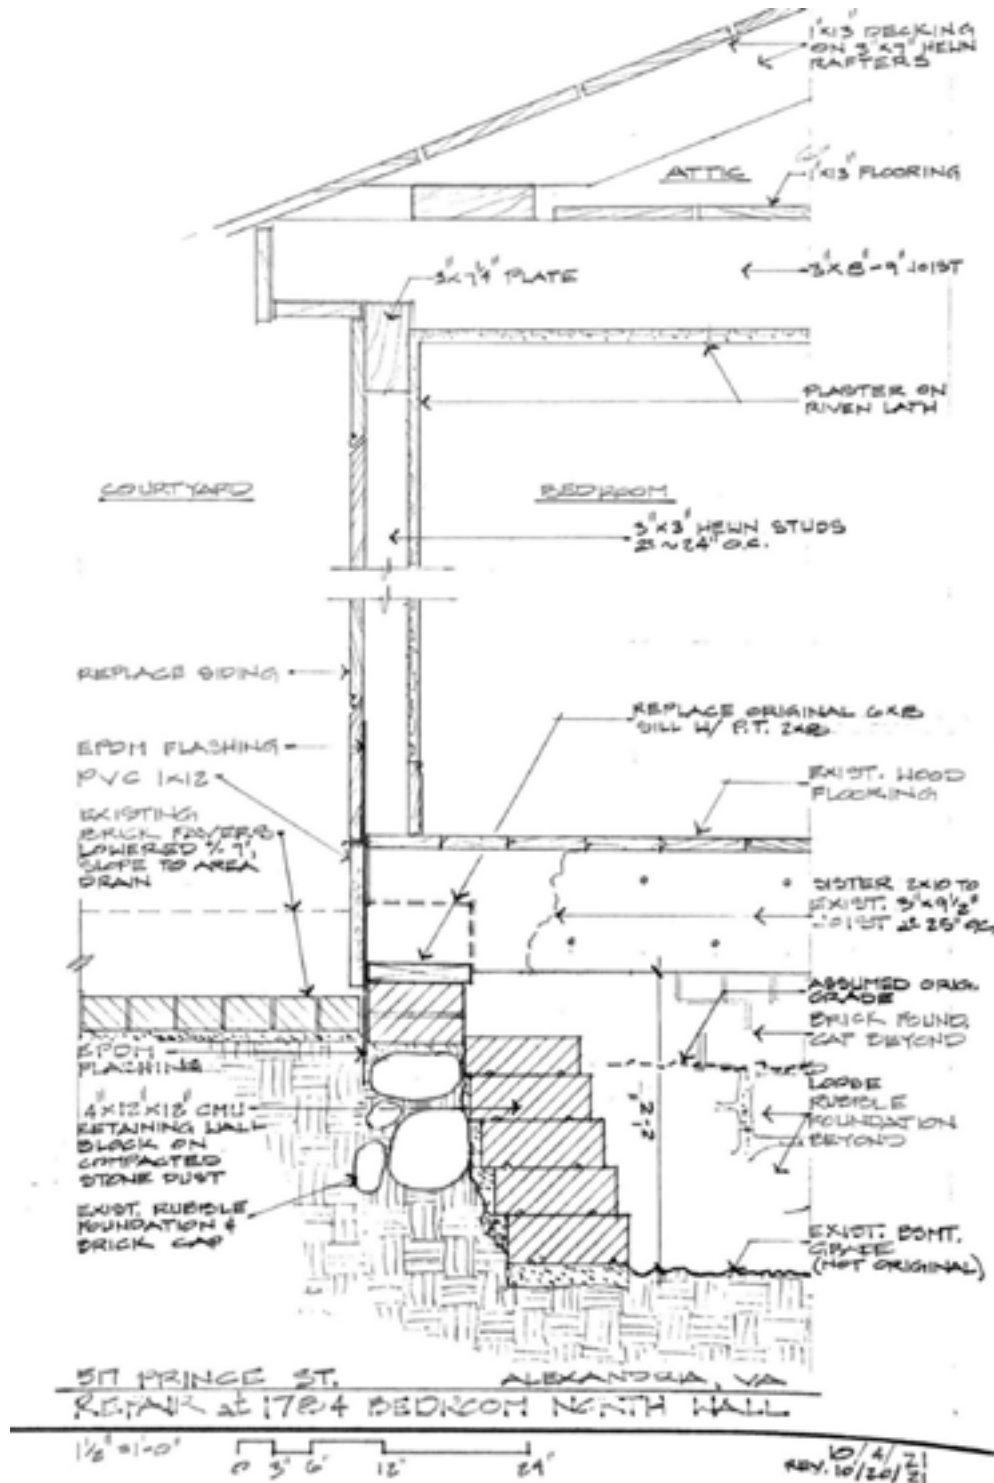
Al Cox, Section Drawing for Repair of North Wall of NE Chamber
